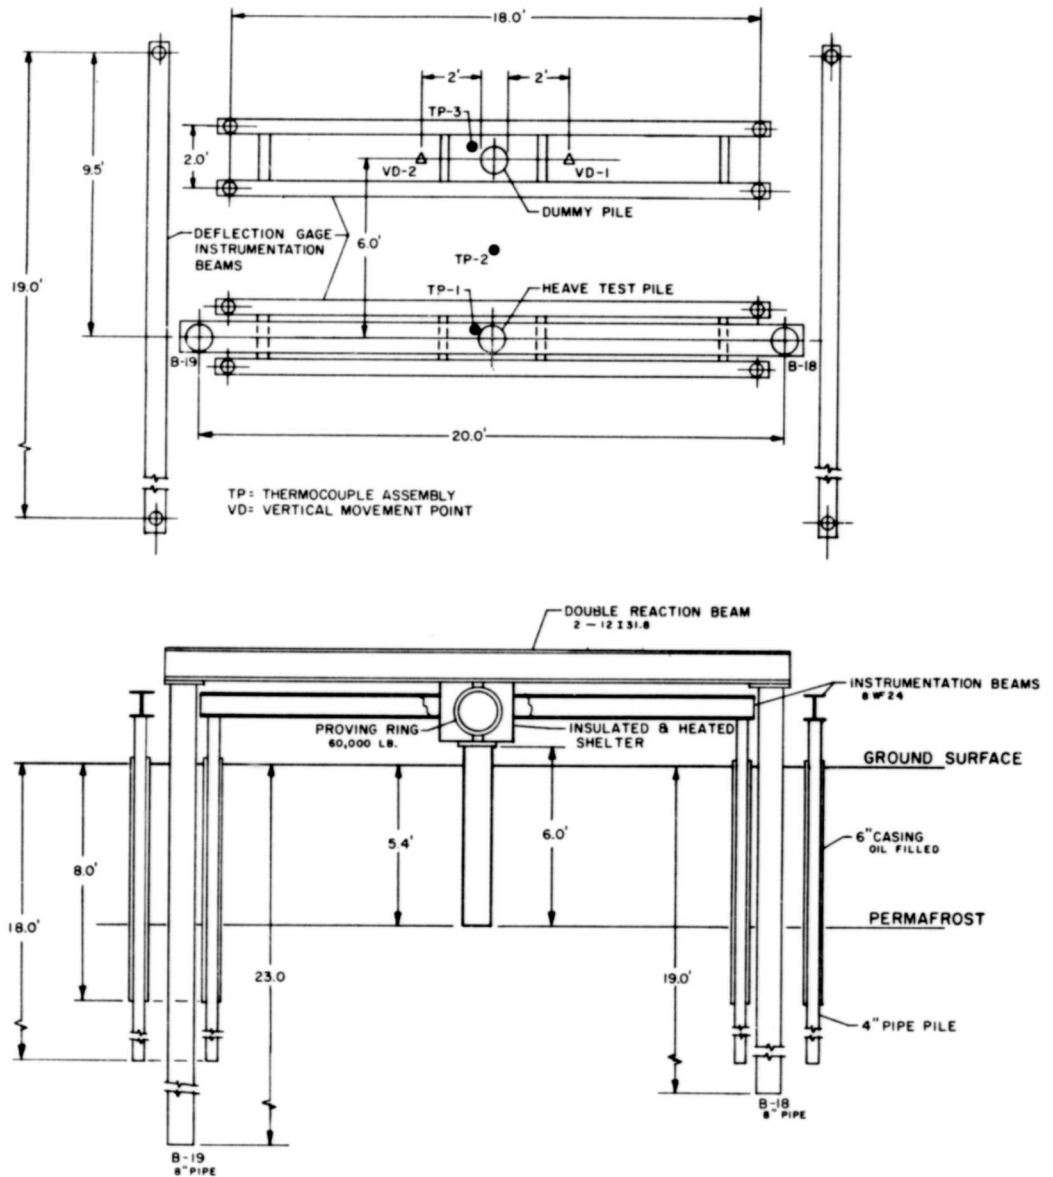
Plan and elevation view of 1956-57 heave test installation. Proving ring housed in wooden box insulated with foamglas and heated with light bulbs.
